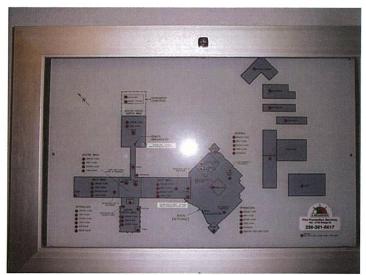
Main fire alarm control panel in room 052 on Wing 'A'
